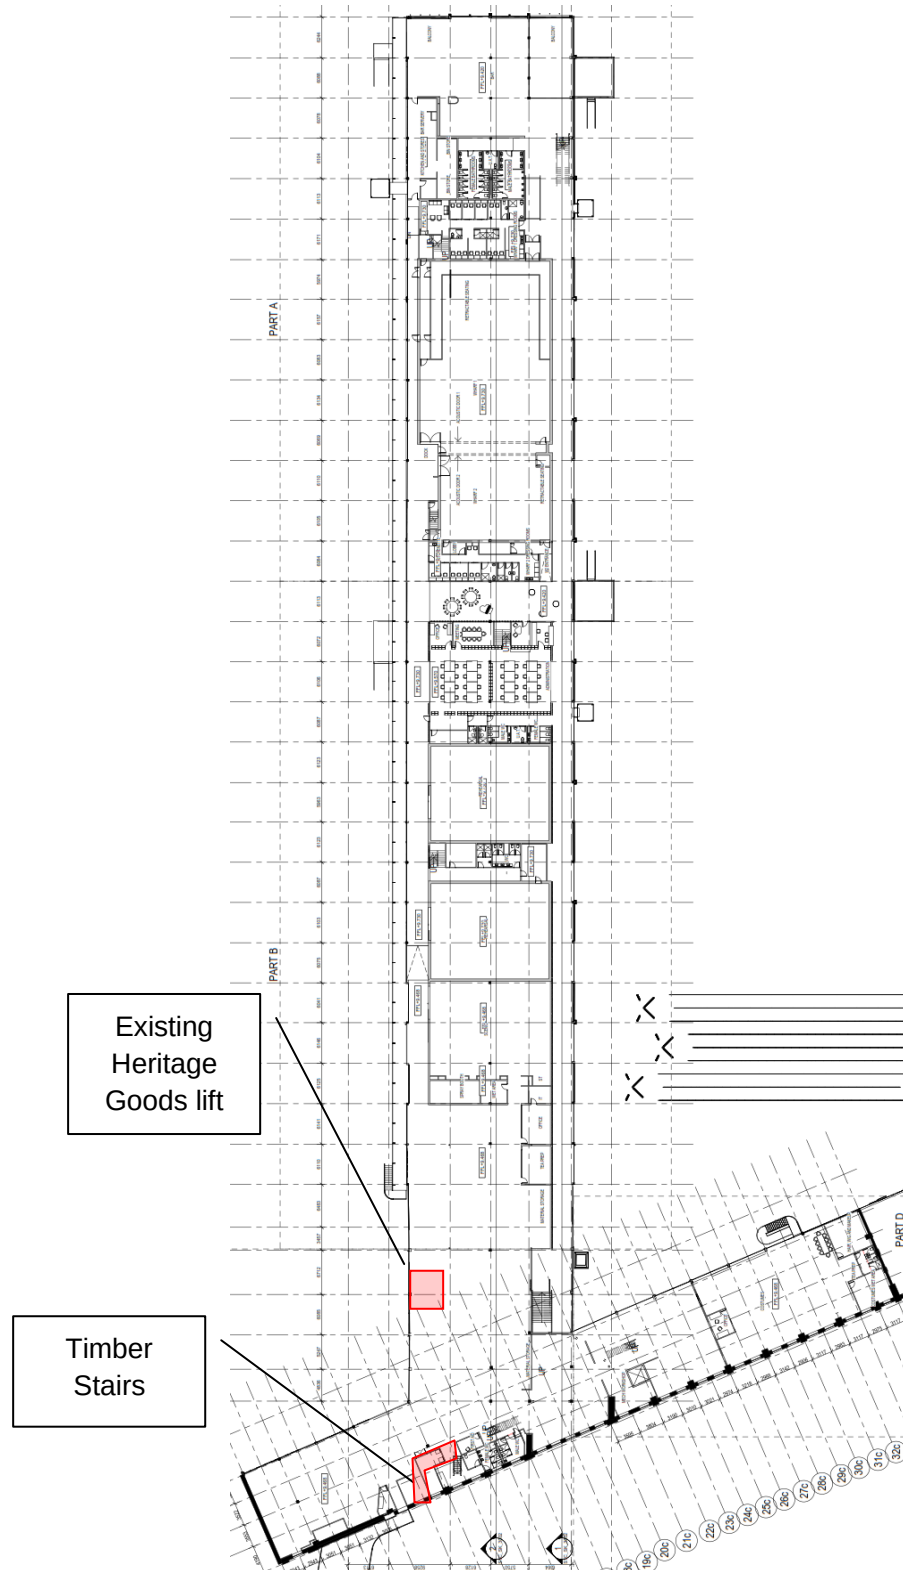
Level 1 Wharf 4/5. Plan by Hassell.¹⁸
